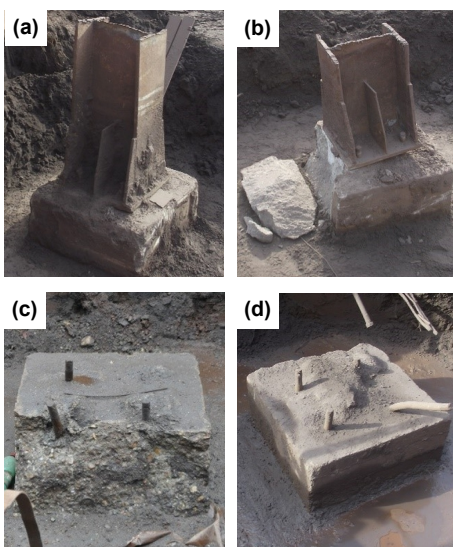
The left (a) and right (b) foundations and foots of the column C1; the left (c) and right (d) foundations of the column C2.
